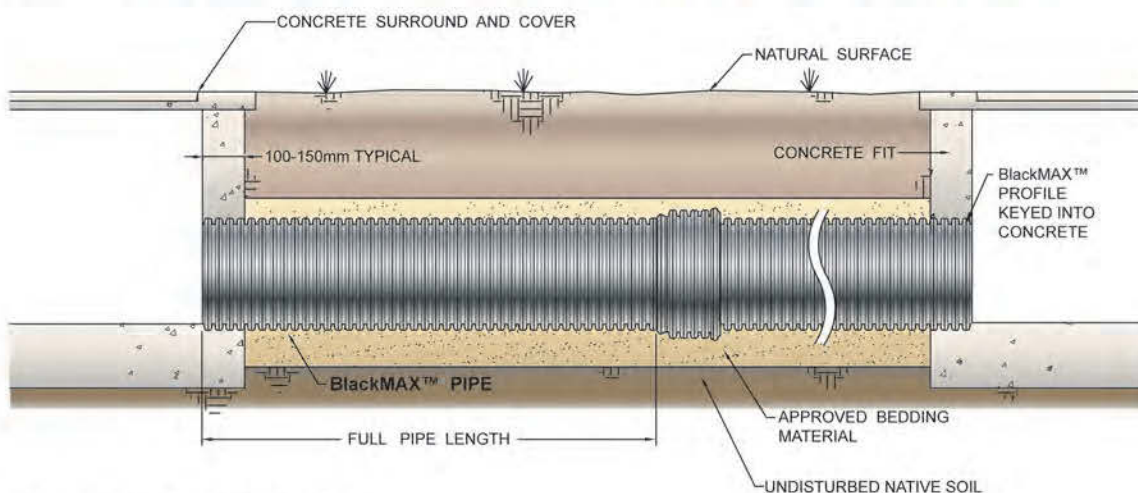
Typical connection to structure: BlackMAX™ pipe & concrete storm-water pit
